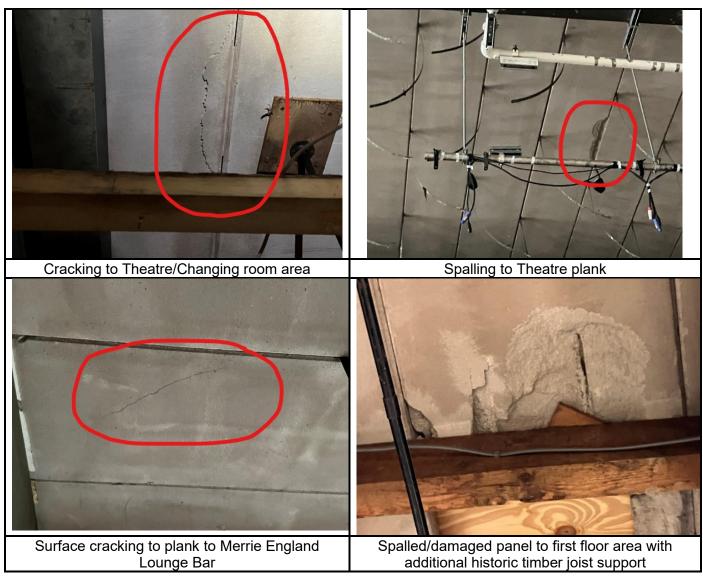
Examples of visual inspection cracking and spalling. Source Thomas Consulting (2023).
